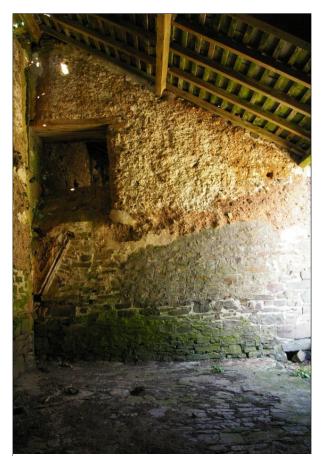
East interior face of B3 showing combination of stone and cob build; viewed from the west.
